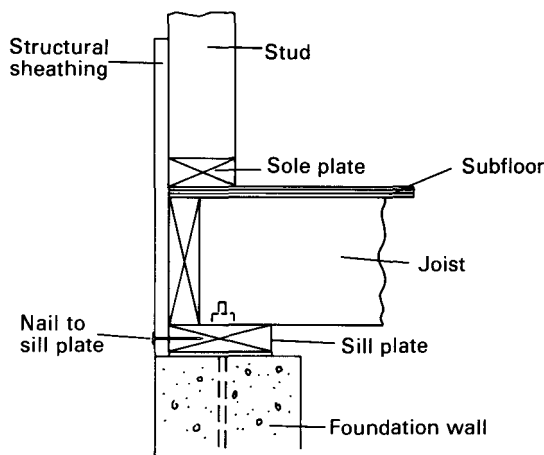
Structural sheathing nailed to sill plate for tying the wall to the foundation wall.
